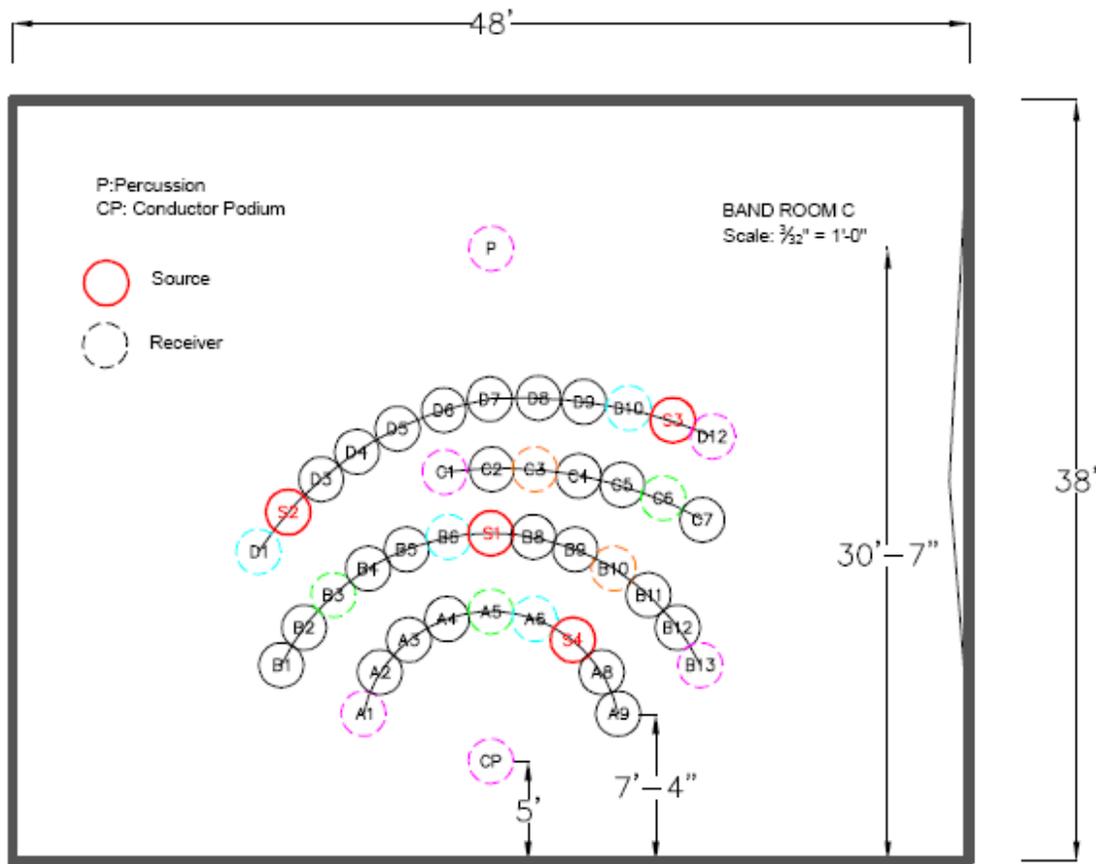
Band room C floor plan showing the acoustical measurement locations of the sound sources and receivers.
